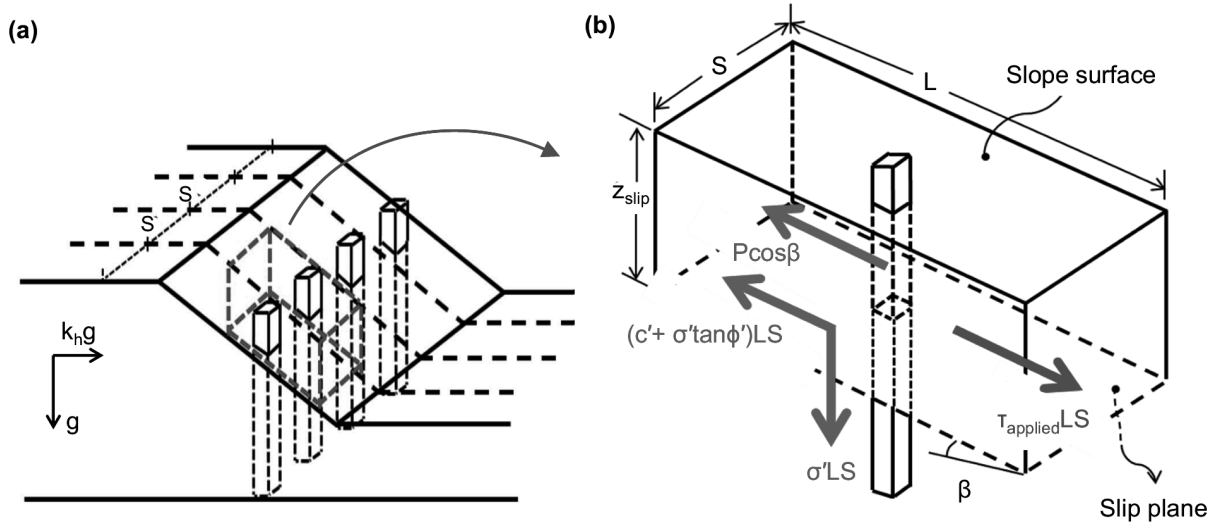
Slip mechanism in pile-reinforced slope; (a) overall configuration; (b) forces acting on a pile-stabilised slipping soil element (after Al-Defae and Knappett, 2015).
